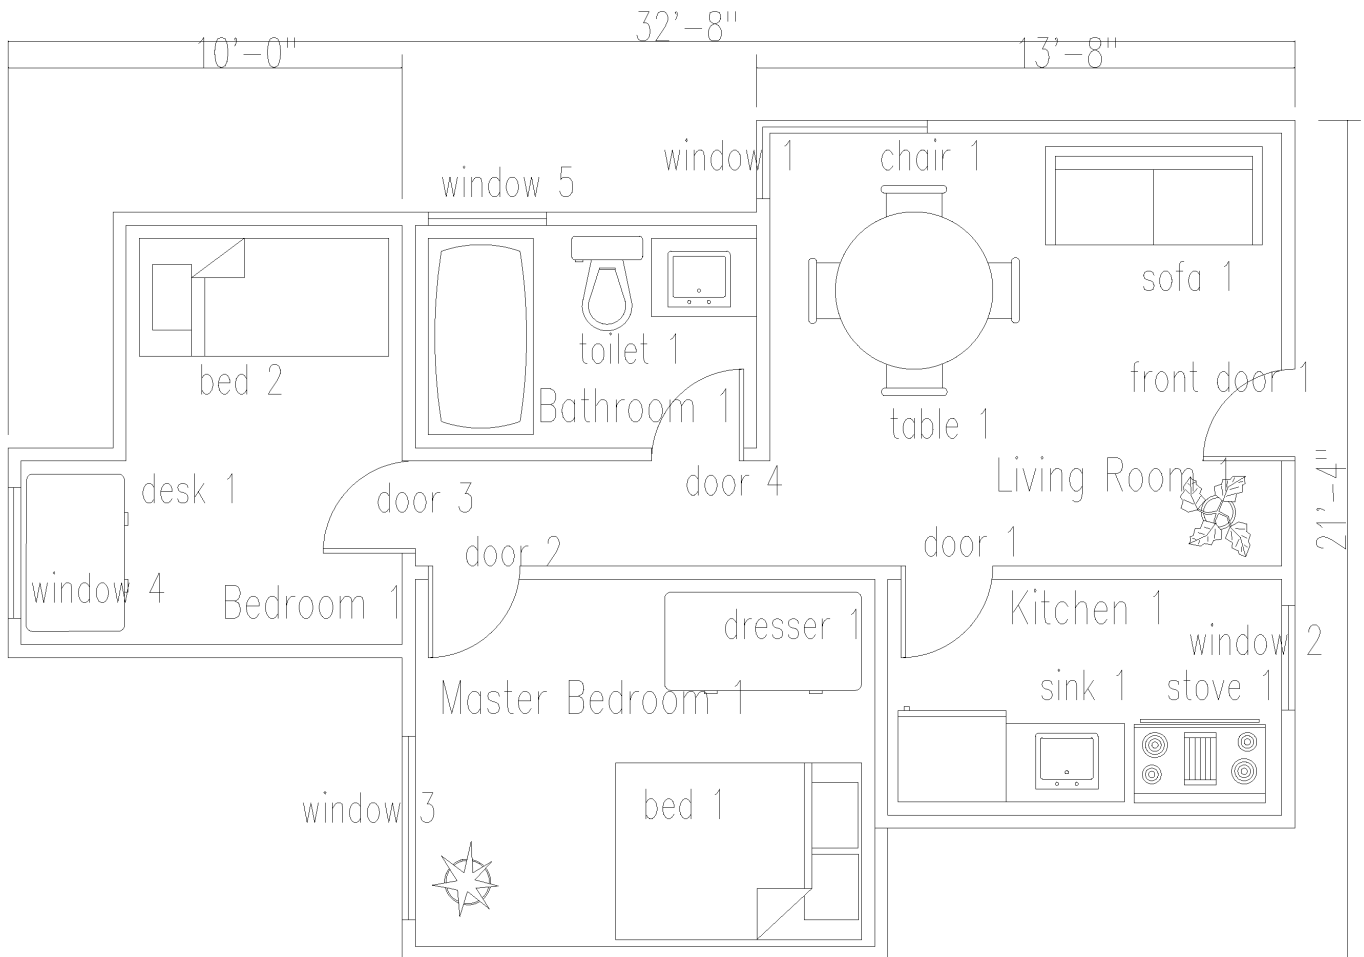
A typical apartment floor plan analyzed by ICADS.
